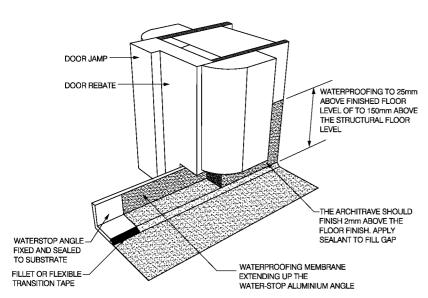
(A) EXAMPLE OF LIQUID WATERPROOFING AT DOOR OPENING FRAMEWORK
